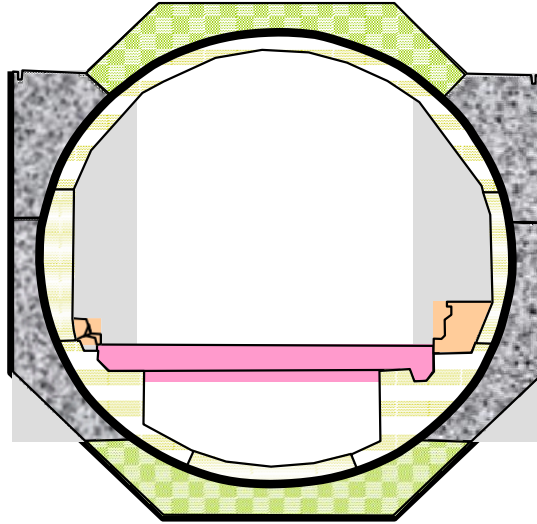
Double Shell - Second Hampton Road Tunnel, Virginia
